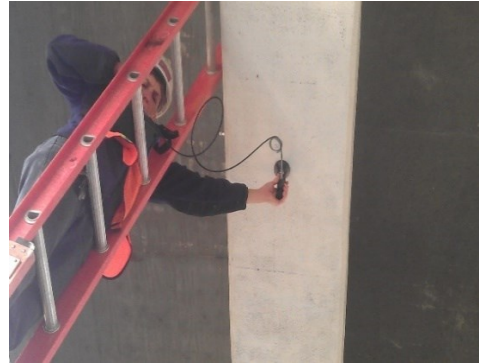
Pull-Off test on sample 2 of girder 2, Bridge 8
